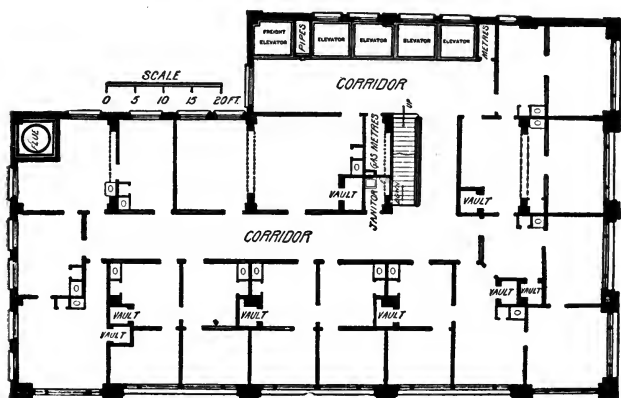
Champlain Building, Chicago. Typical Office-floor Plan.
